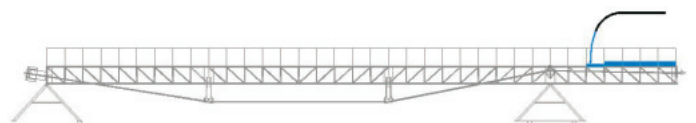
Type Y concreting process – sequential loading starting from the cantilever's end [6]
